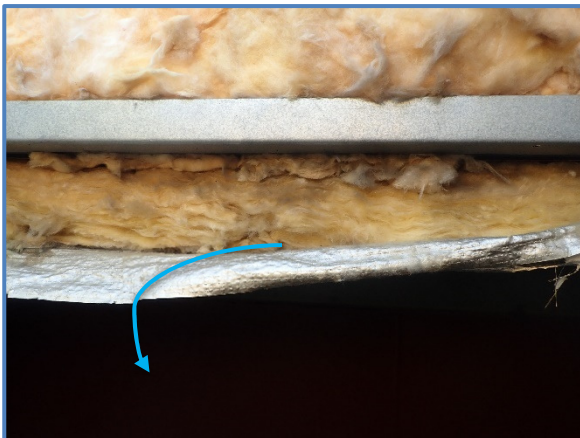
Water was observed dripping off the vinyl liner of the roof assembly in the main building. The source of the water could not be determined.
